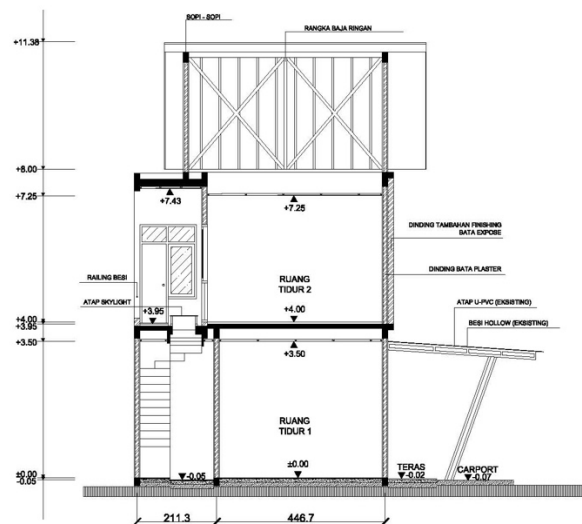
Section Y–Y of the Proposed House (Scale to Fit)
